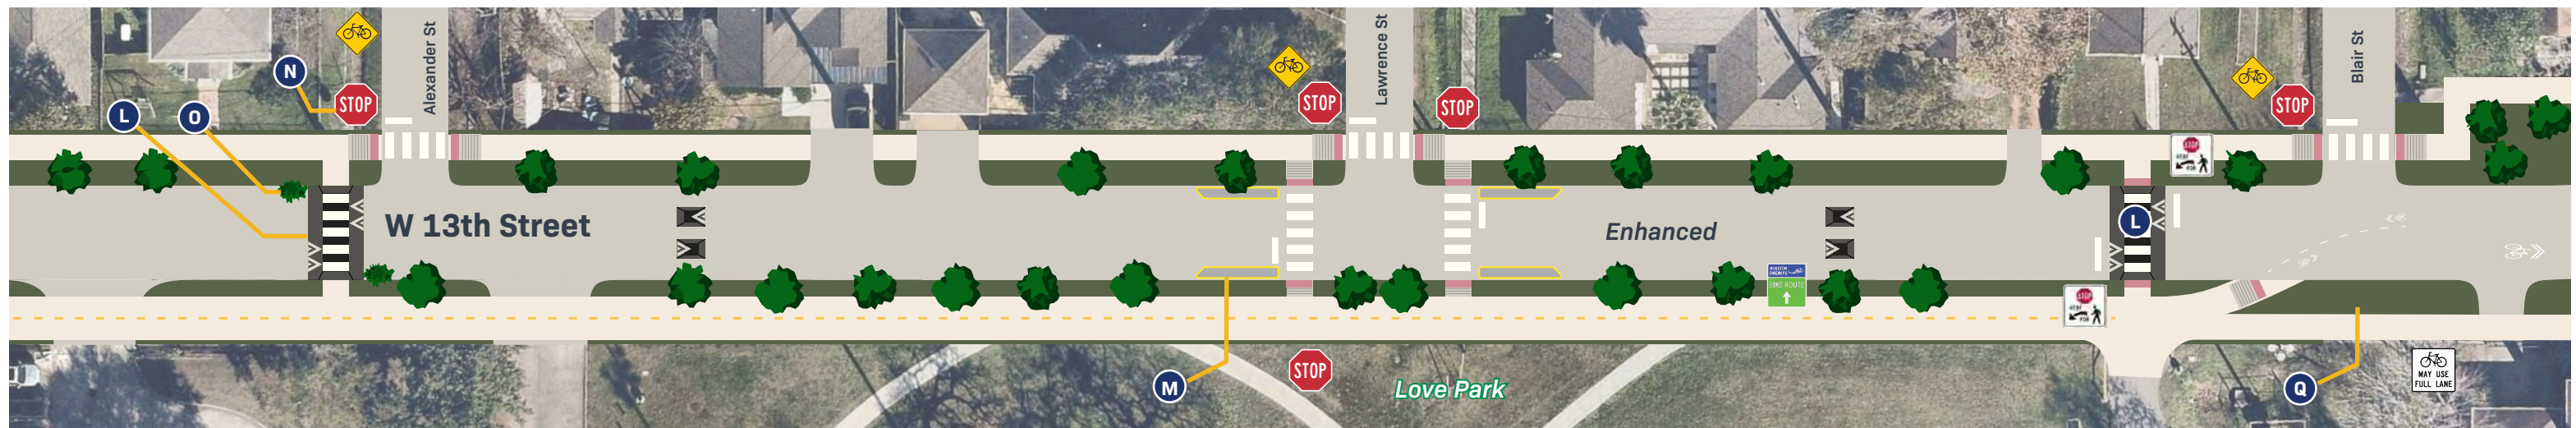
Example Enhanced Neighborhood Street - Alexander Street to Blair Street (Source: Team Analysis, 2026)
